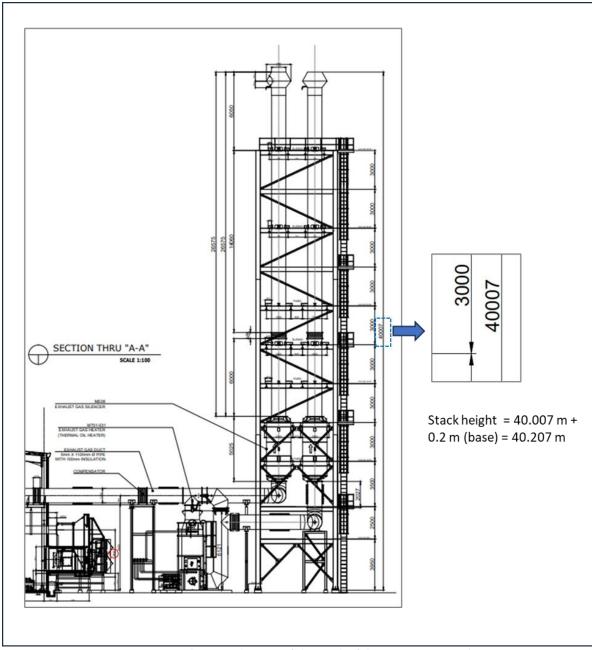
Elevation drawing of the stack of the existing powerplant
